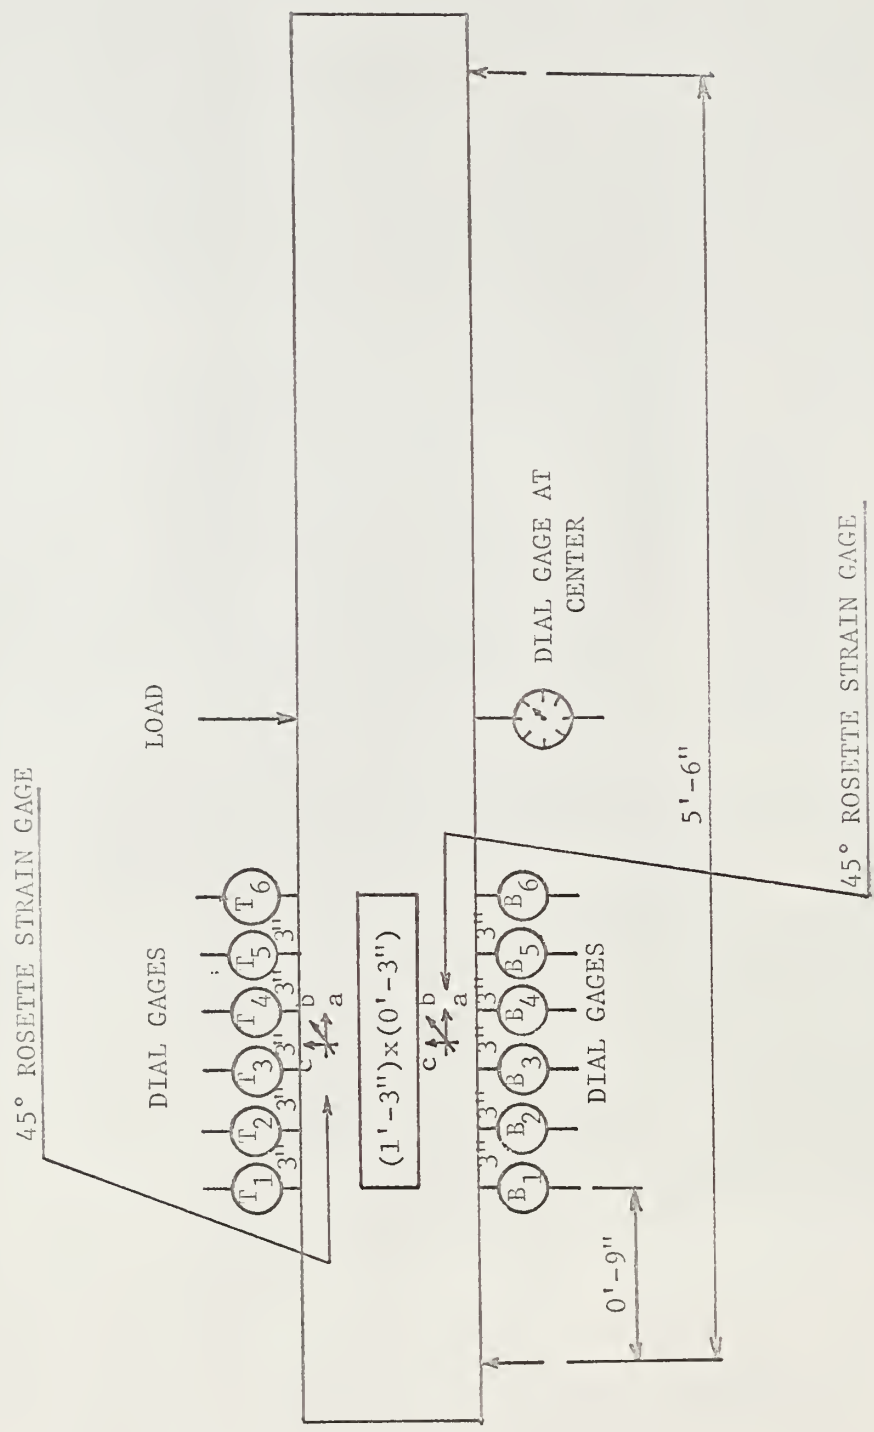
ARRANGEMENT OF DIAL GAGES AND STRAIN GAGES FOR ALL TEST BEAMS.
